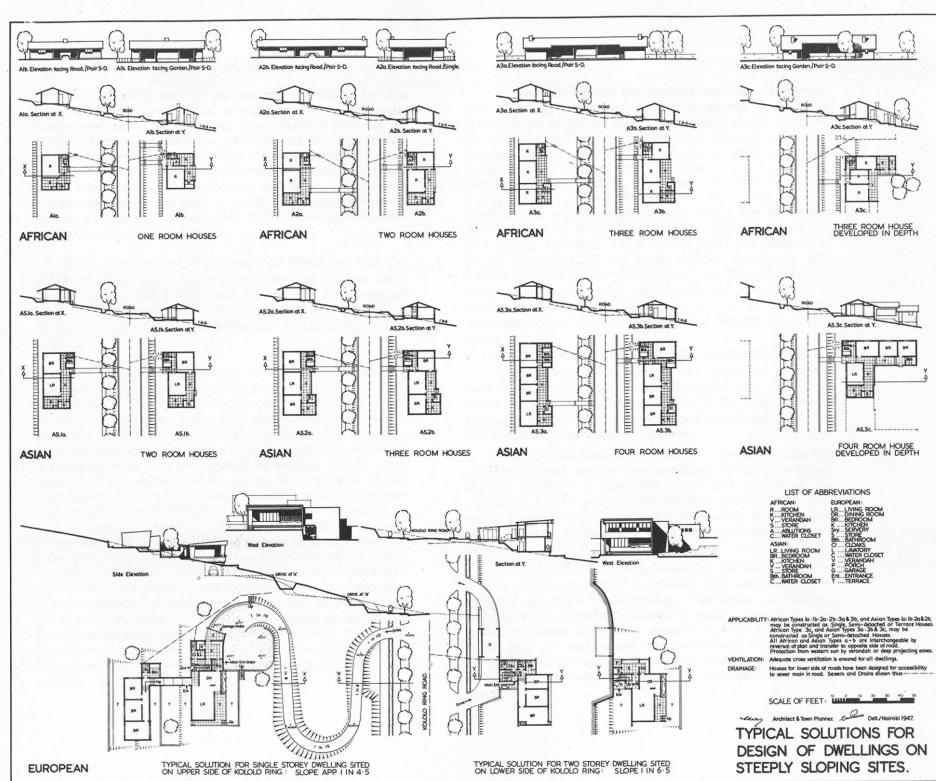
Ernst May, Dwelling Types, Kampala, Uganda, 1945–47. Ernst May, *Report on the Kampala Extension Scheme, Kololo-Naguru*, (Prepared for the Uganda Government. Printed by Government printer Nairobi) September 1947, n.p.
